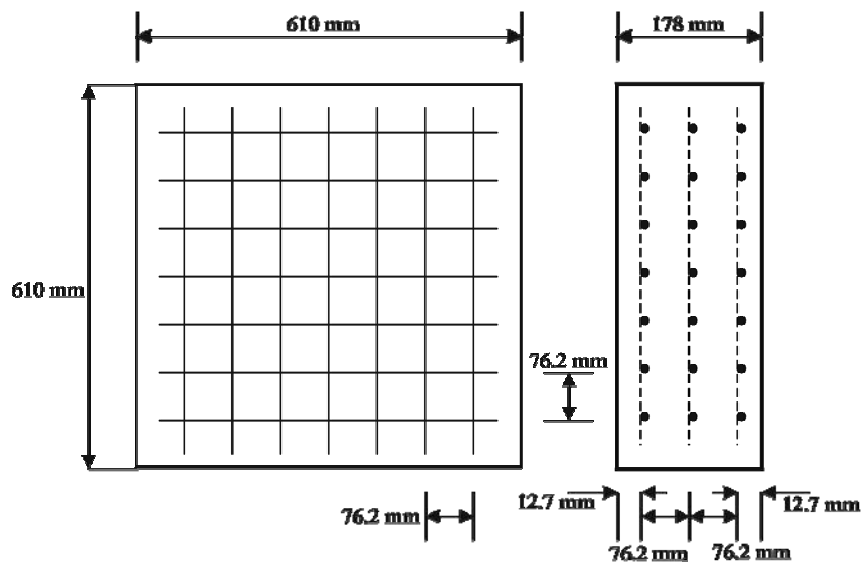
Reinforced concrete slabs used in the missile impact tests of Hanchak et al. [7].
